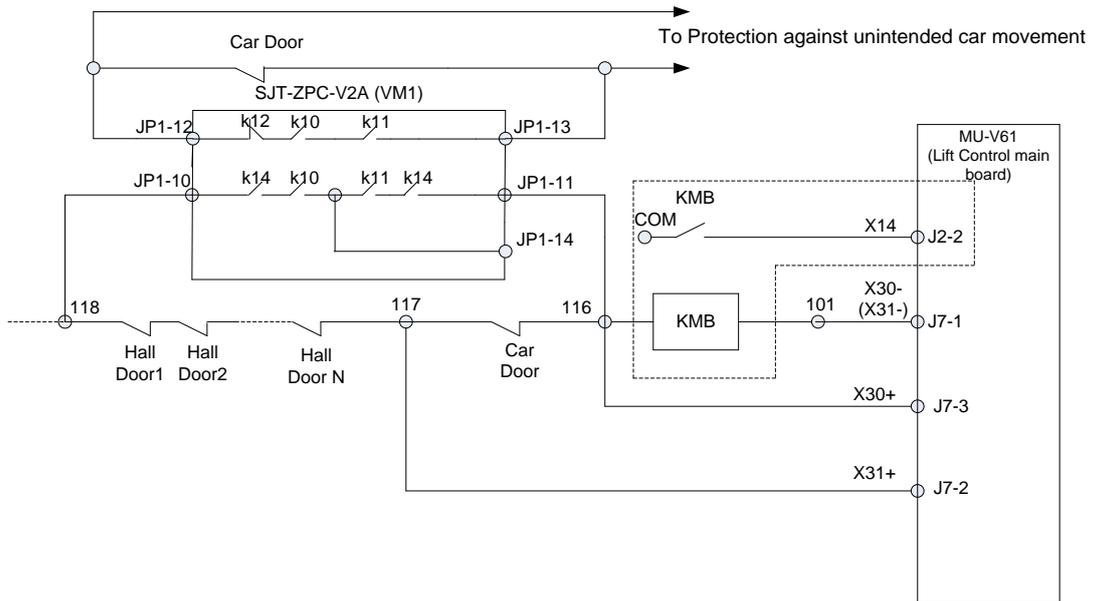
Advance door open & re-leveling & UCMP test & Door short detection control when single door (suit for gearless and geared machine)
